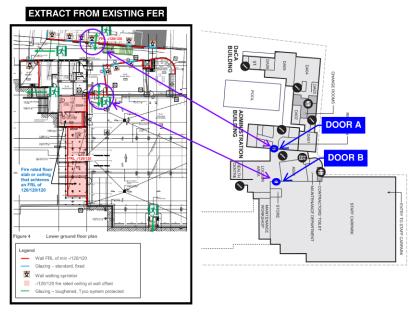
Extract from Existing Defire FER showing Door A and B – Lower Ground Floor
